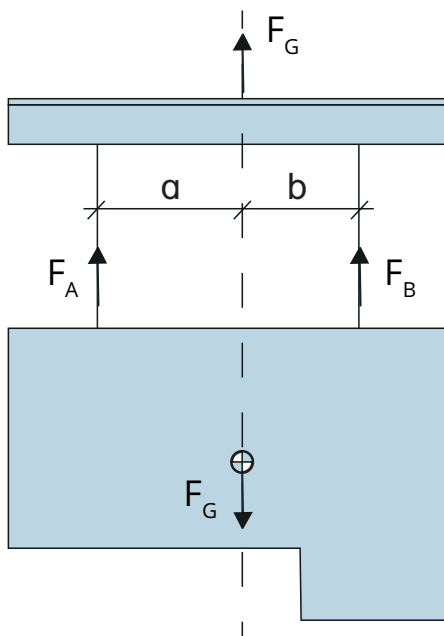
Load distribution for non-symmetrical anchor layout using spreader beam
